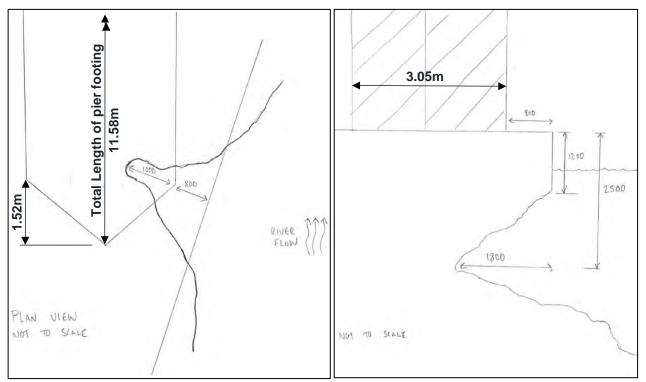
Plan (left) and section (right) of scour undercutting of Pier D of the existing SH8 bridge (Source: Underwater Solutions Ltd, 2014 and PWD, 1885)
